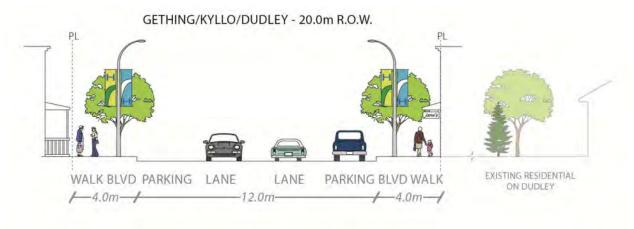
Gething Street/Dudley Drive/Kyllo Street
